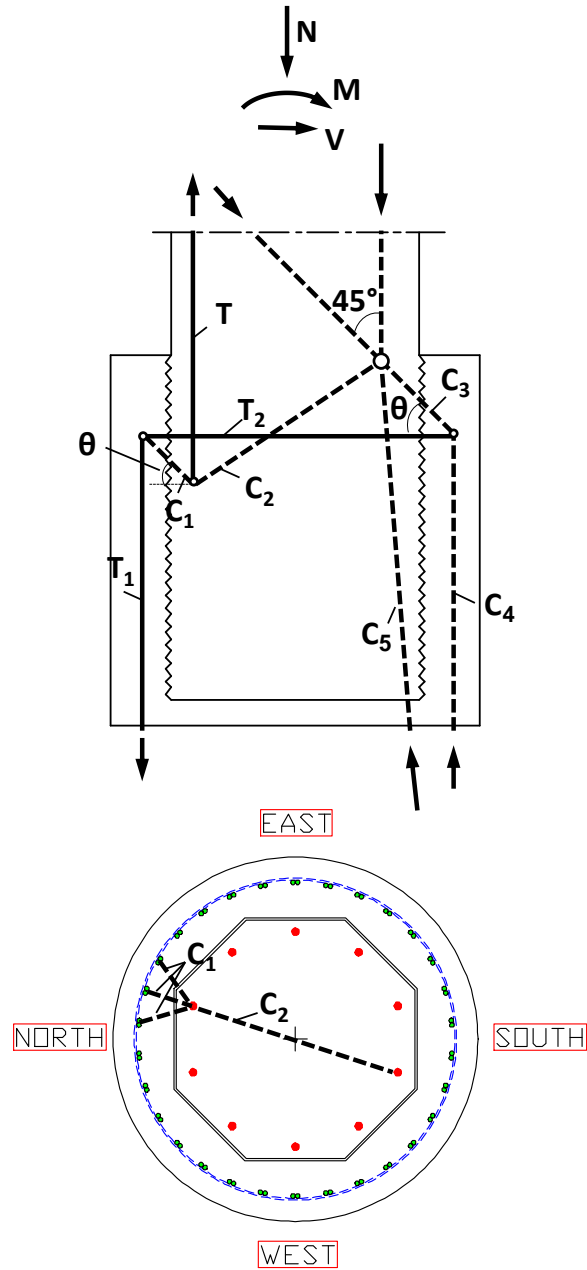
Elevation and Plan of STM model for load transmitting from one column reinforcing bar to the three nearest shaft bundles bars
